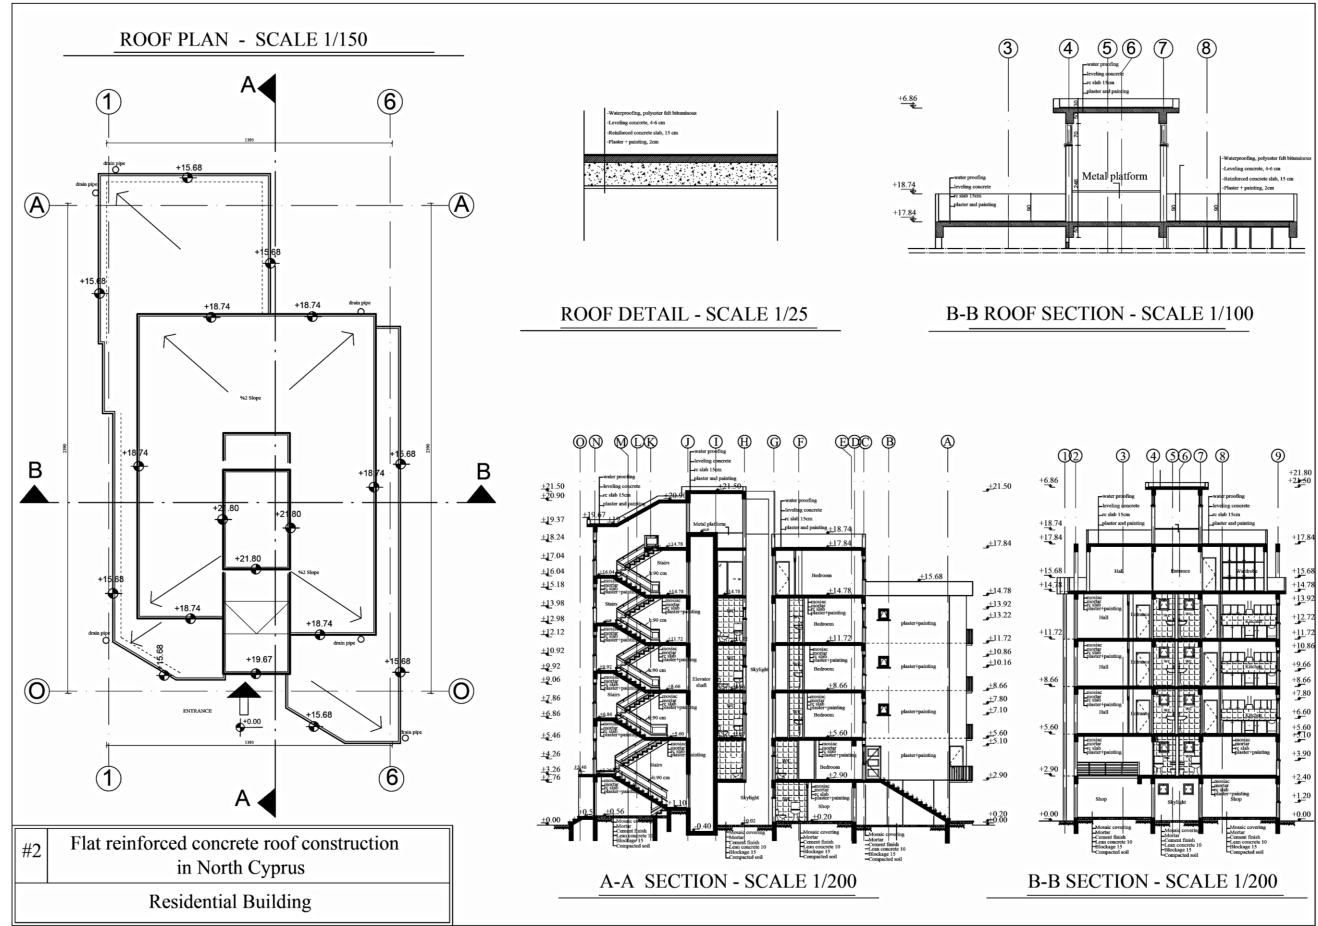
Flat reinforced concrete roof construction in North Cyprus
